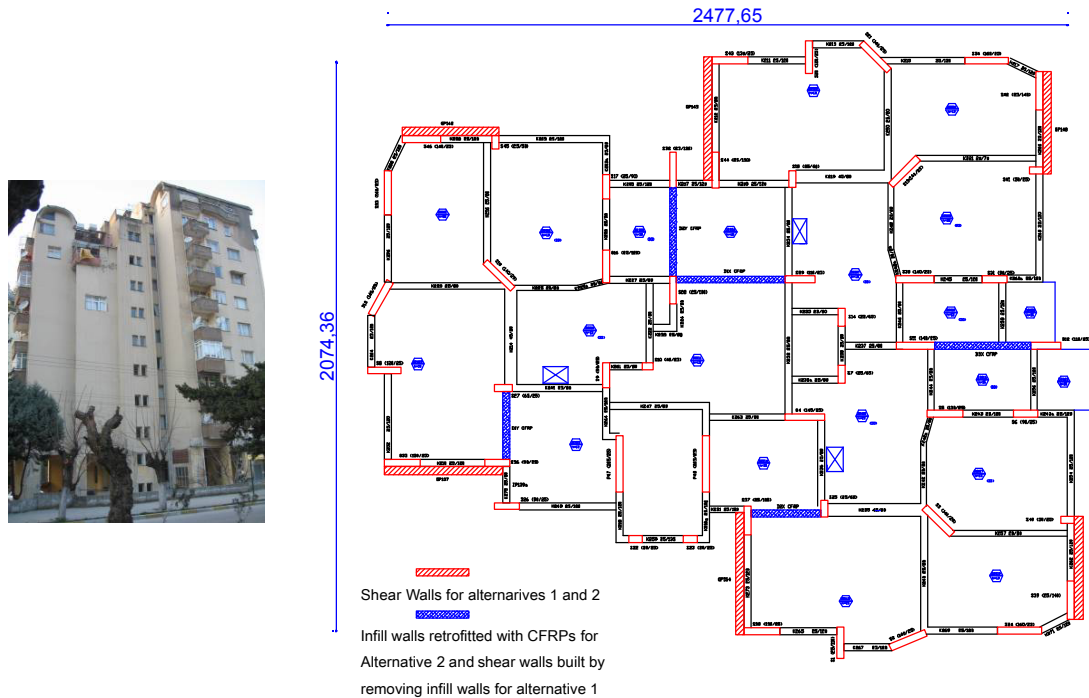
Building Picture, Floor Plan and Strengthening Locations.
